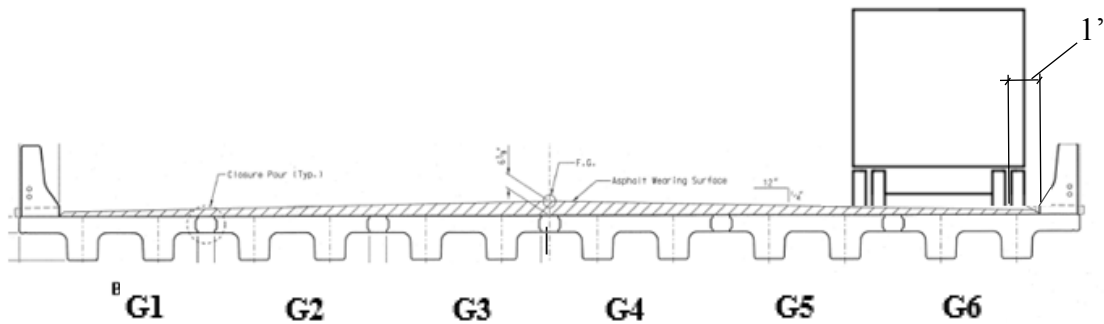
Load Configuration 1 (Exterior Girder Single Truck)
